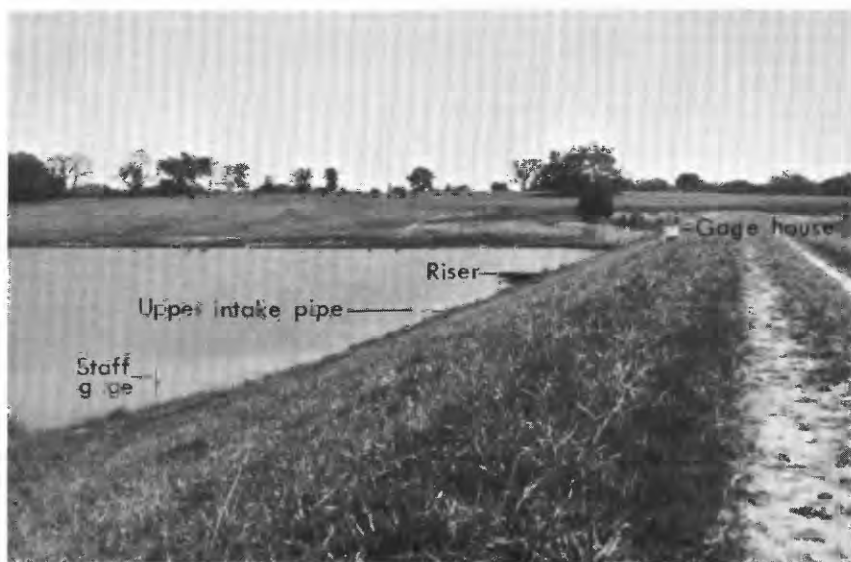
Upstream face of dam showing staff gage, upper intake pipe, gage house, and riser. Reservoir stage is about 15.2 feet.
